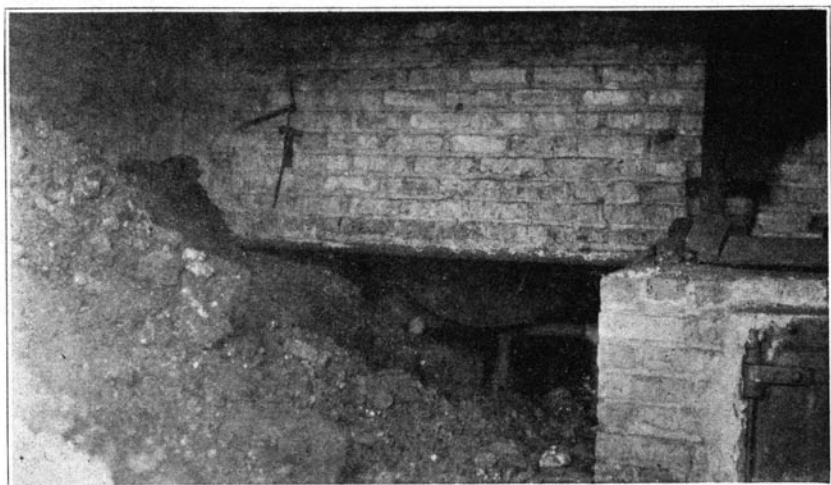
COAL PILED IN CONTACT WITH BRICK WALL OF FURNACE
